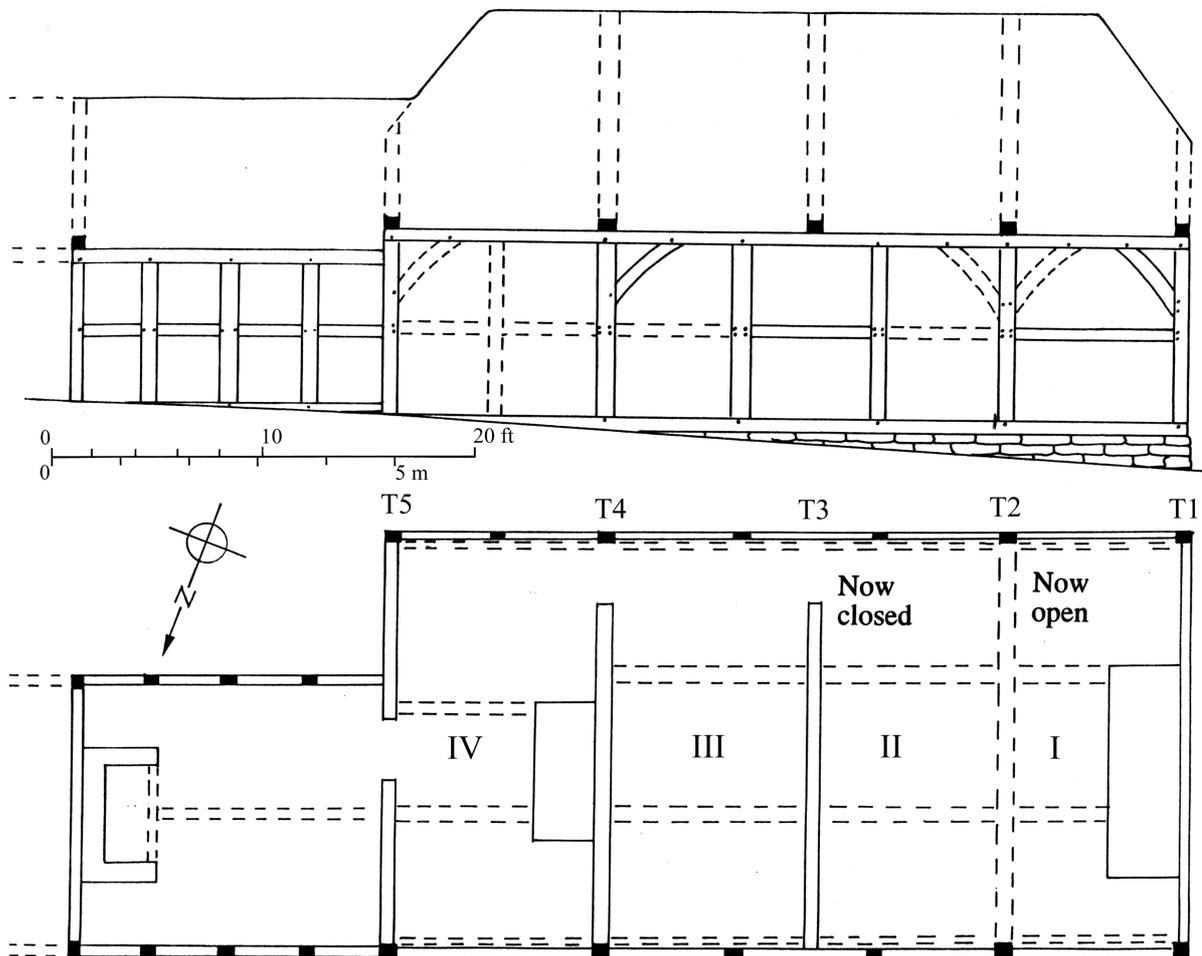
Restored elevation and plan, showing truss and bay numbering (from Alcock *et al* (1971-3)).
